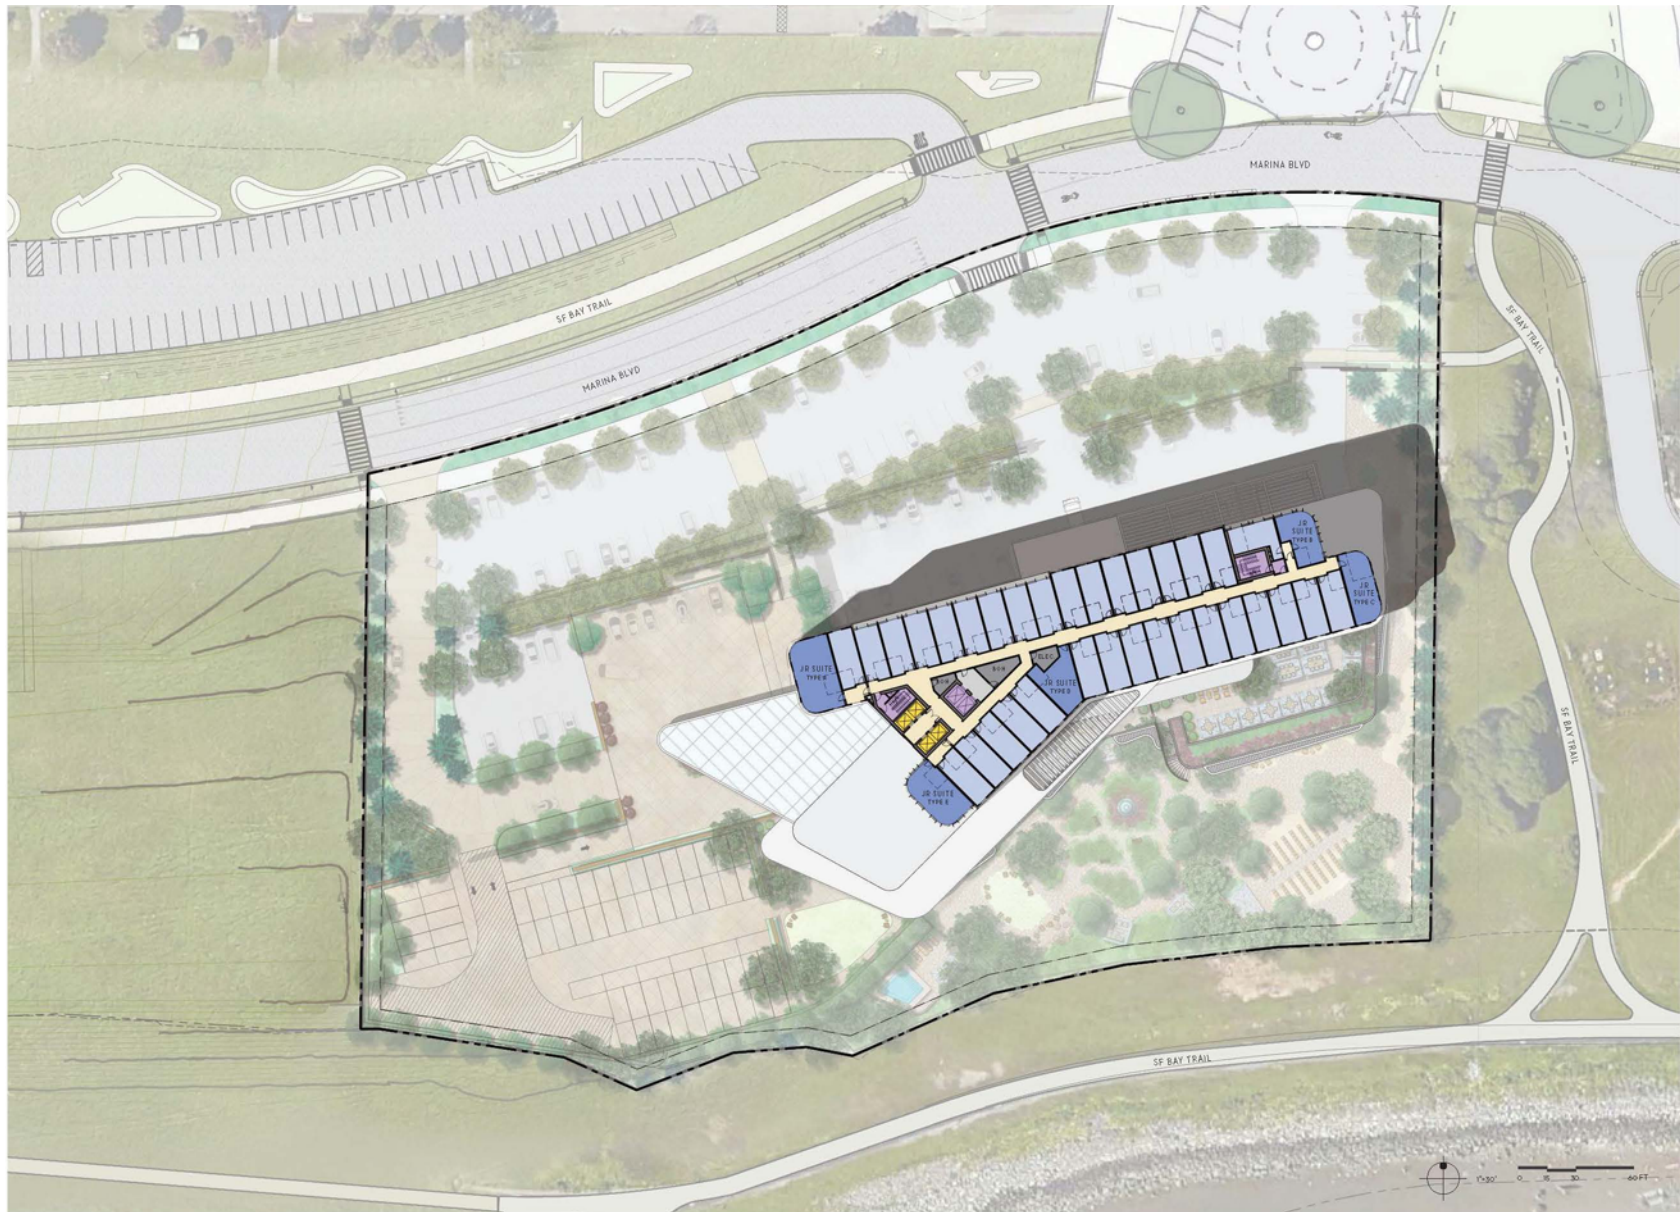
Floor Plan, Floors 4 through 7 (these floors would have substantially similar floor plans)
